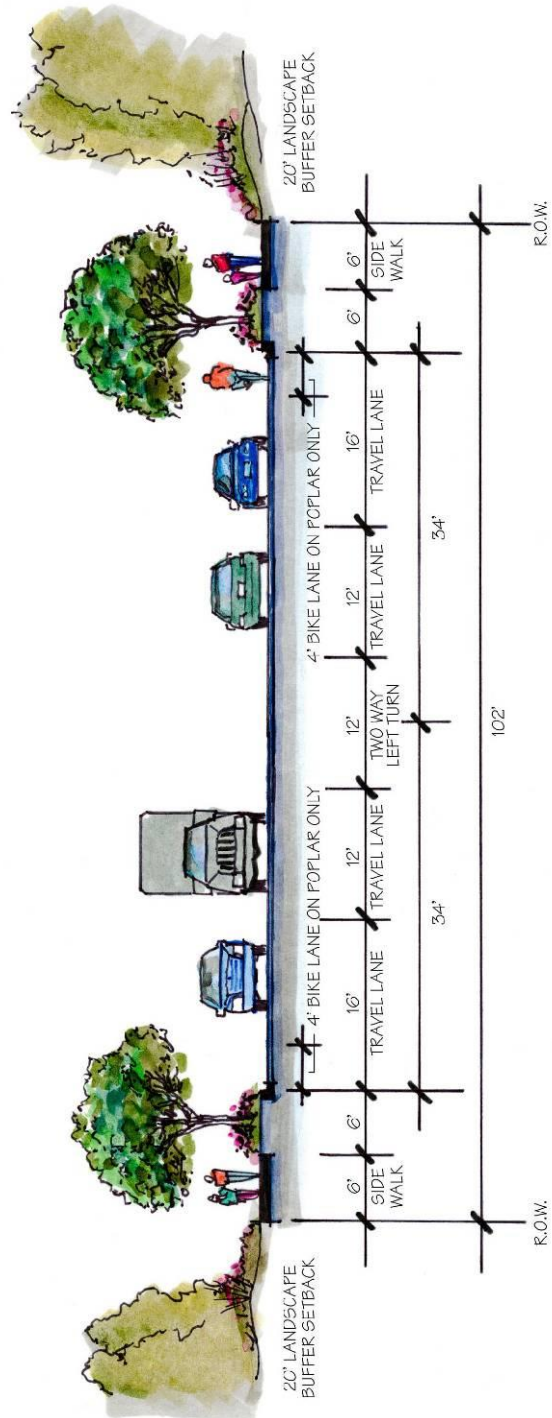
Primary Highway – 4 Lanes – Cross-Section D-D (Beech Avenue, Fontana Avenue, Mulberry Avenue, and Slover Avenue)
